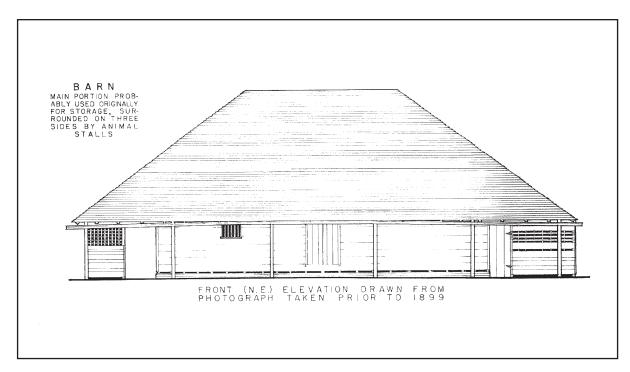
Front elevation of the Homeplace Plantation barn, St. Charles Parish, Louisiana (Historic American Buildings Survey, LA-155, Sheet 10).
